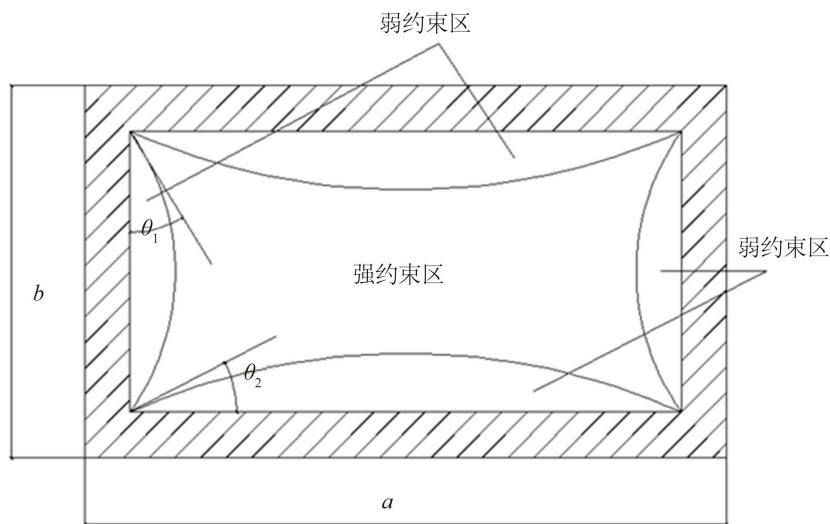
Confining mechanism of rectangular steel tube of concrete core
